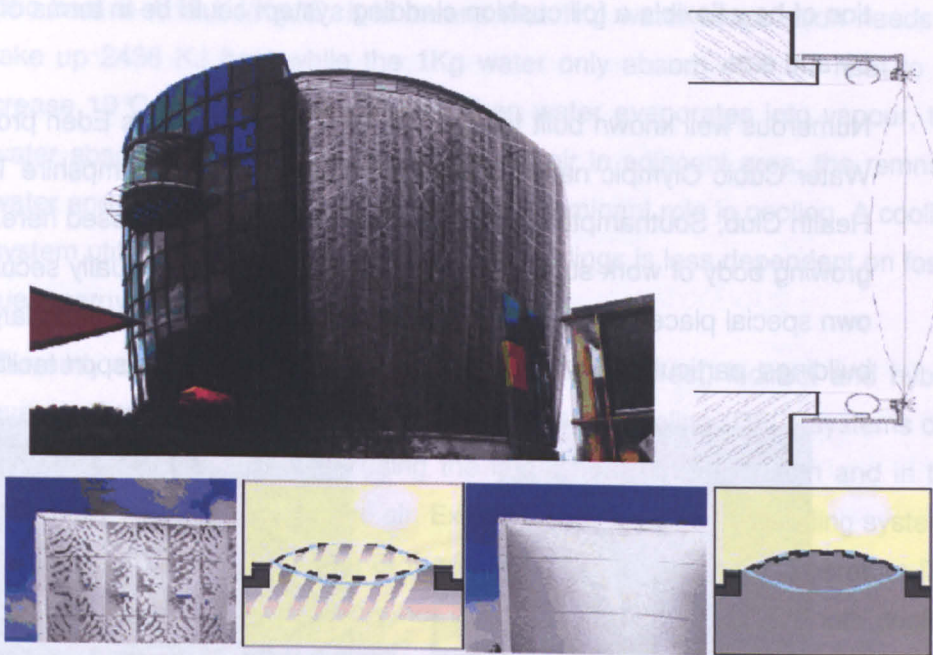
Wall cladding detail . [Building example: Cycle bowl Exp 2000 pavilion, Hannover, Germany. Architects: AtelierUweBruckner]
